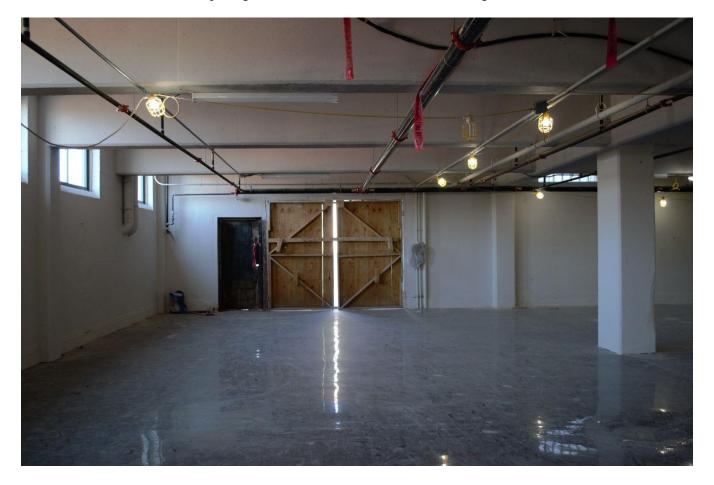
South end of first floor with slab cut for new stairs and mezzanine in the background, looking southwest.
